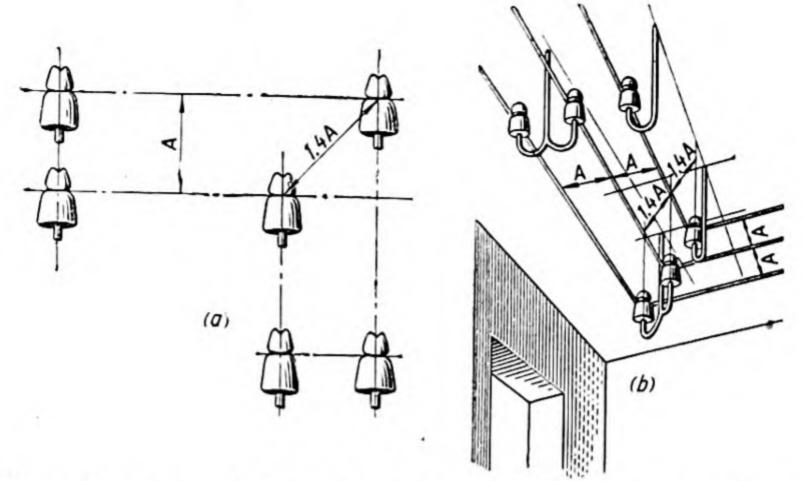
Layout of lines in marking off pin-insulator supported wiring:
